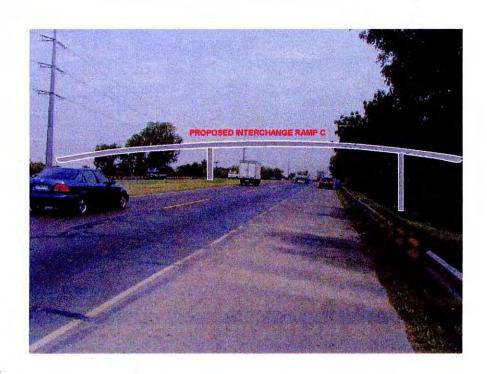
NORTH LUZON EXPRESSWAY
